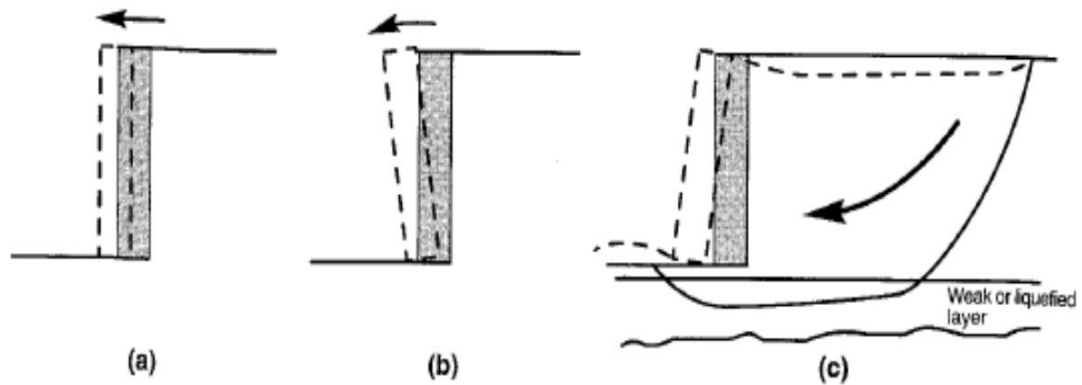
Typical failure mechanisms for a gravity walls: (a) sliding: (b) overturning: (c) gross instability failure
